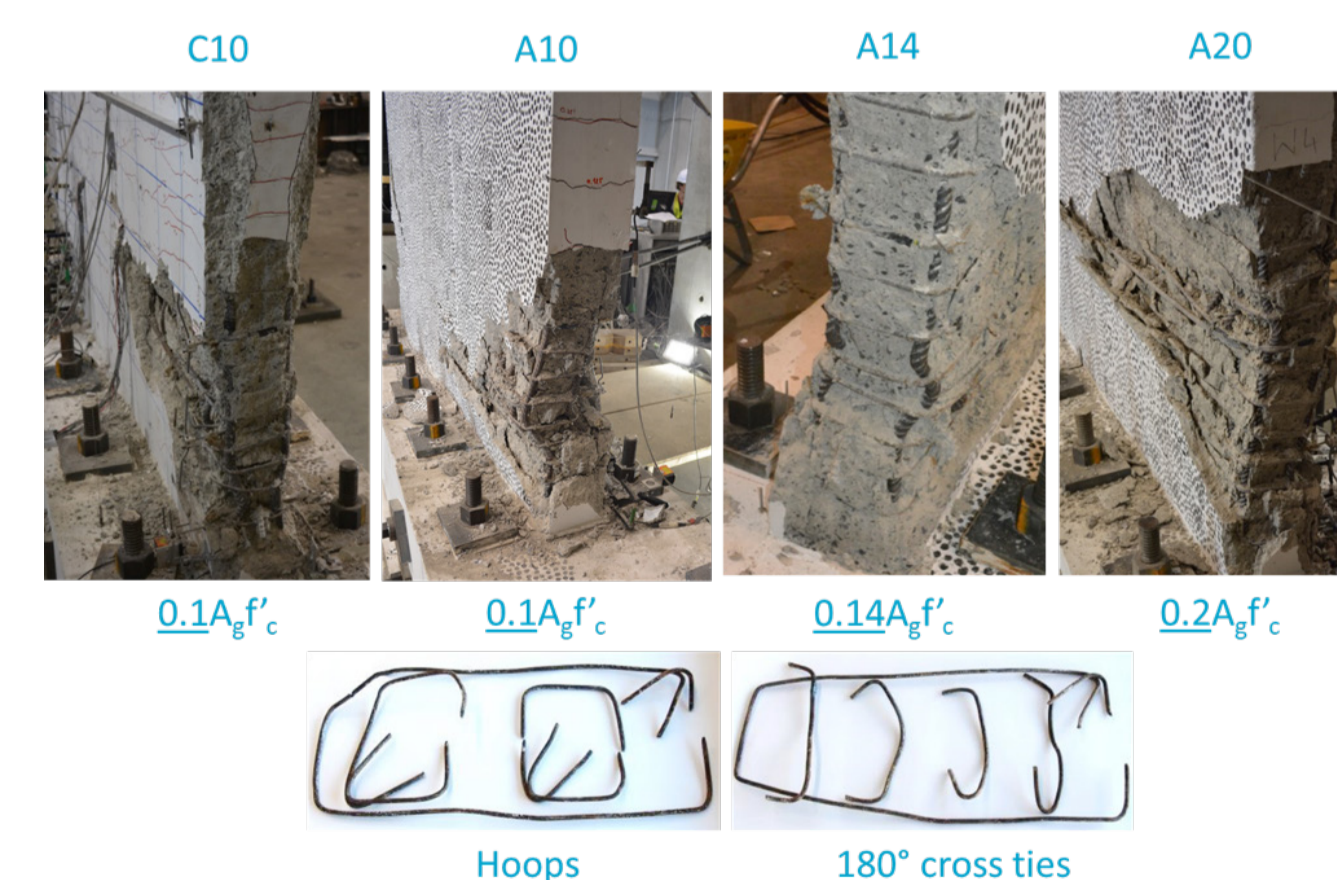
Final damage states of each wall after failure (top) and typical failure of transverse reinforcement (bottom).
